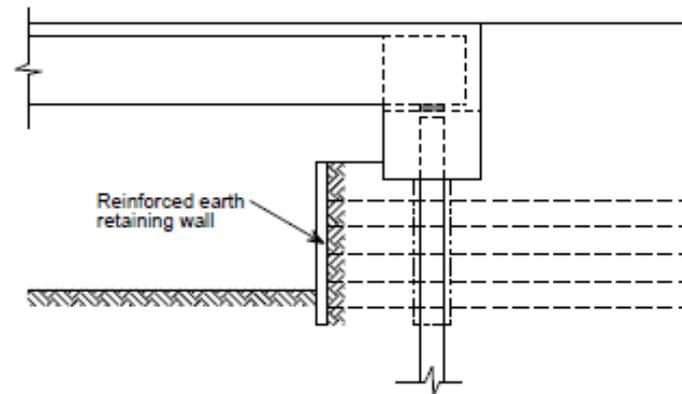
Framed abutment - with reinforced earth retaining wall
